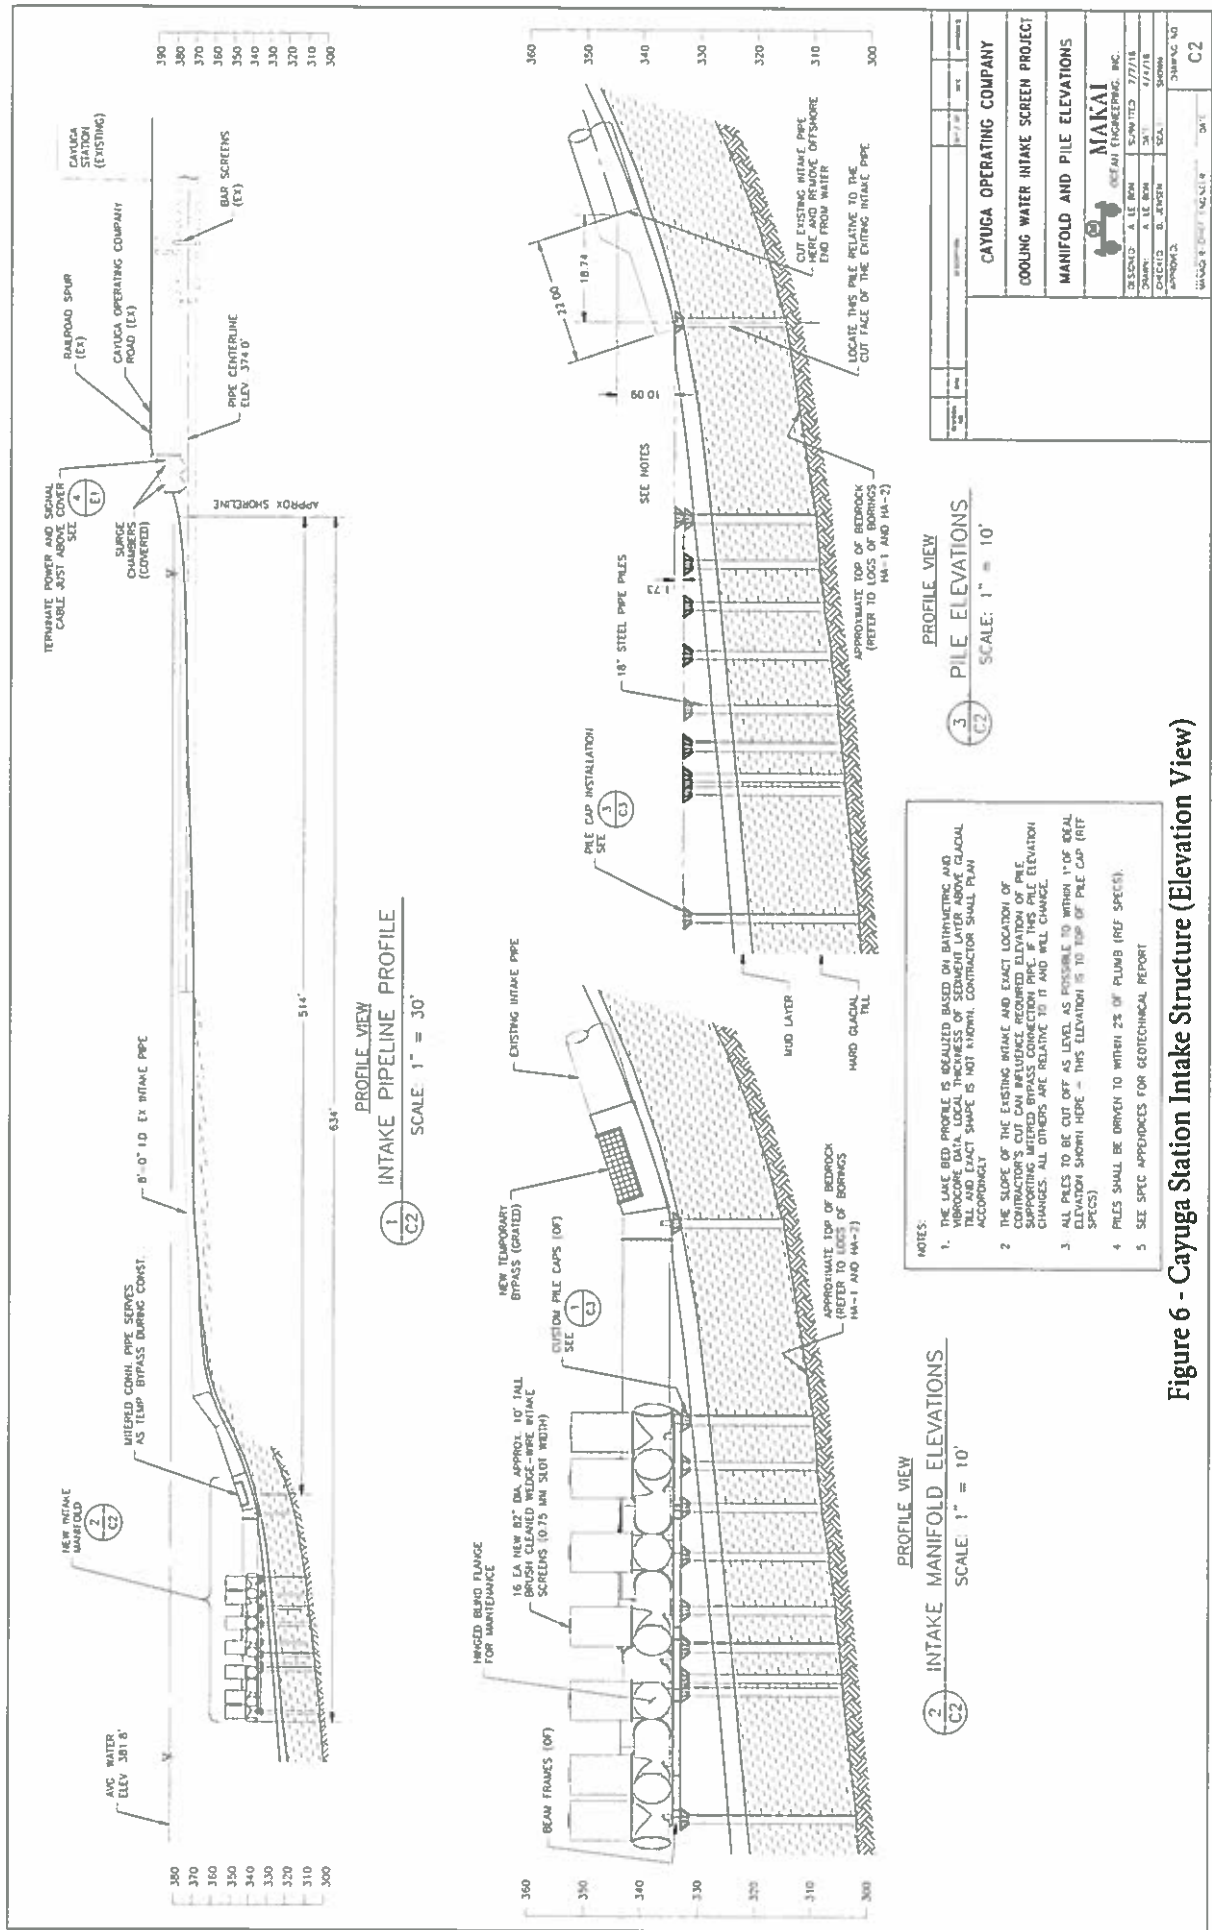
Cayuga Station Intake Structure (Elevation View)
